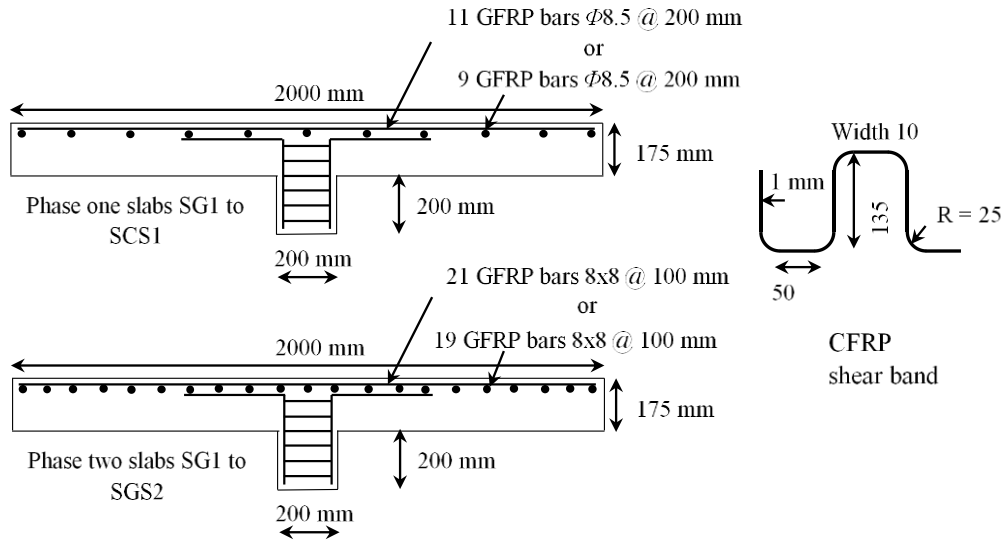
Slab layout and reinforcement details in tested slabs.
